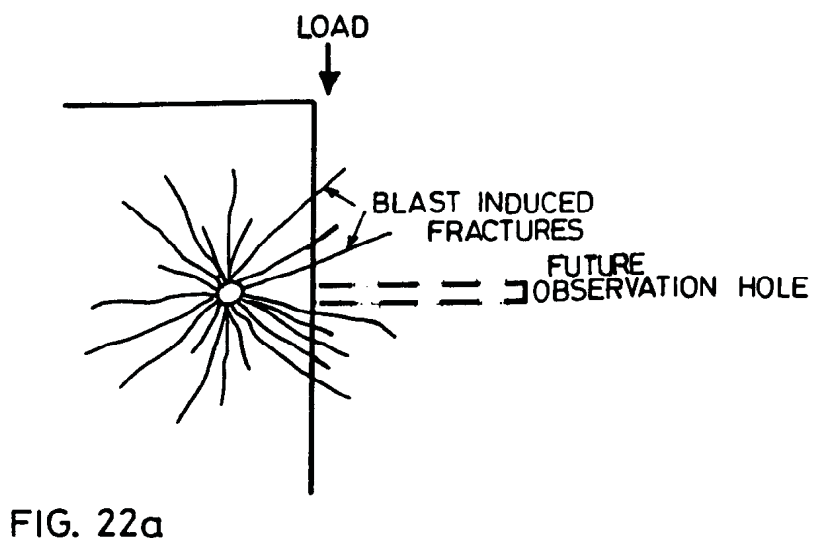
Mode of fracture formation and spalling in drill and blast sections.
